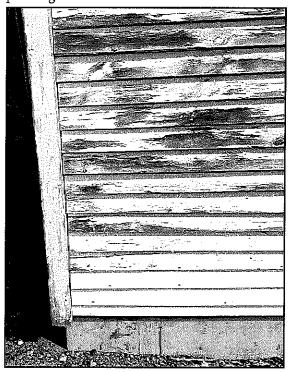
South-west exterior corner with new siding at the bottom and paint peeling from the siding above
